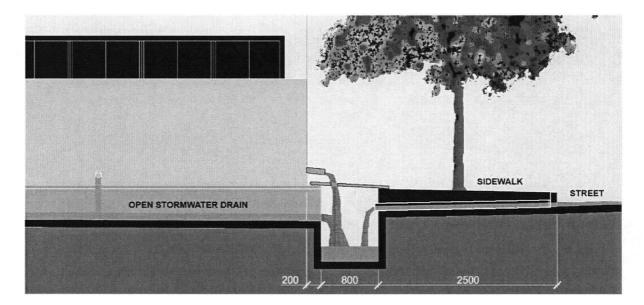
Cross Section showing neighbourhood Open Stormwater Drain network.
